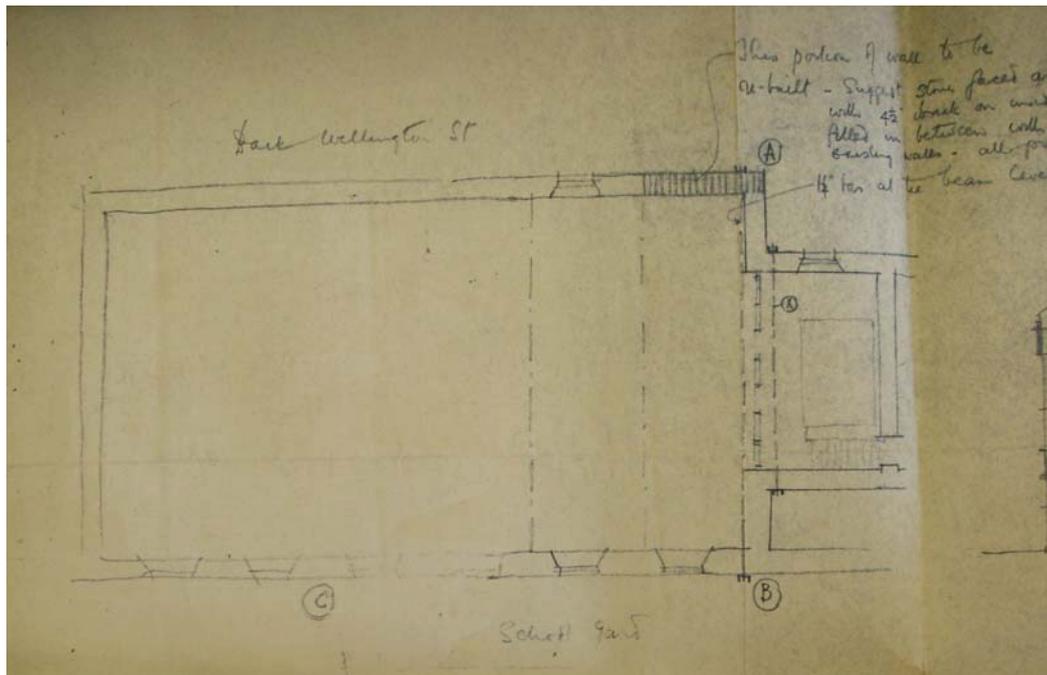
Sketch plan of church showing section of the south-west corner to be rebuilt as a hatched area (CRO (B) BDF C/M/M/7/3/1-3 1958-1960)
